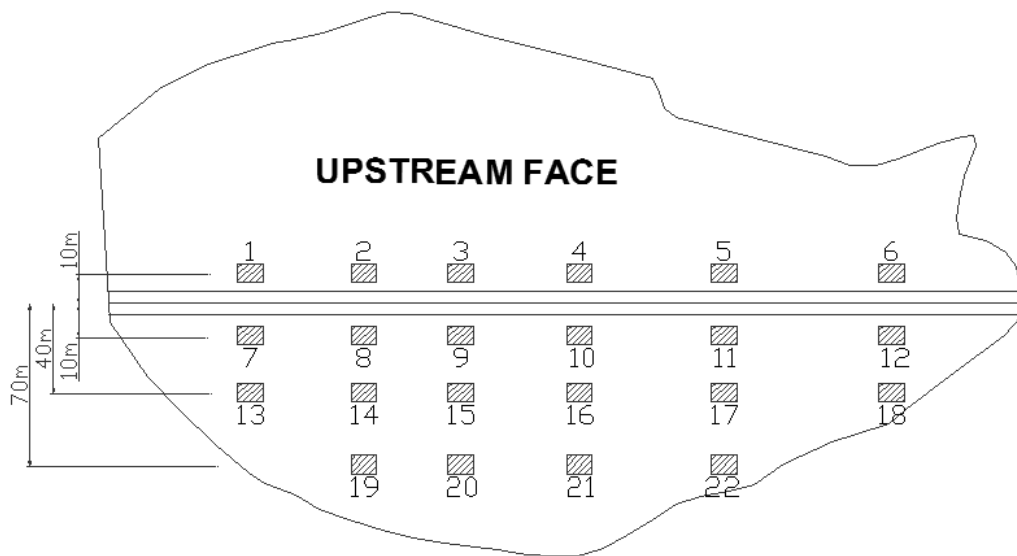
Piezometer locations shown on cross-sections of Bahçelik Dam
